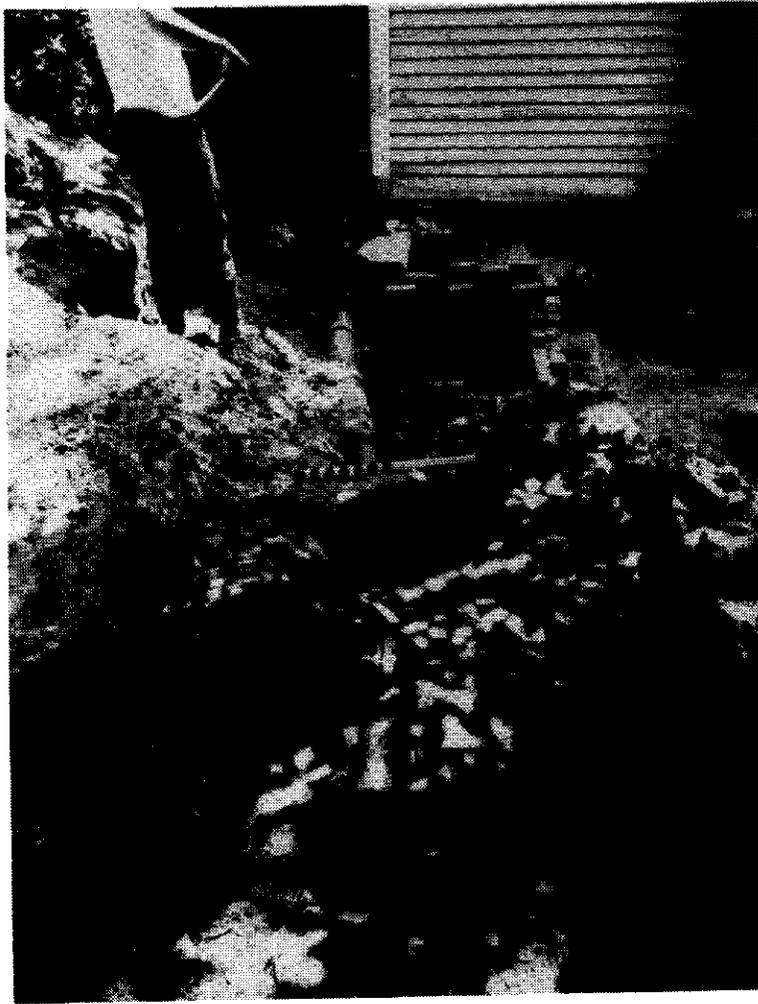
Snow's field photograph showing cesspool, cistern, and barn wall, looking east from house to barn (MIMA.BWP.WS.5).
